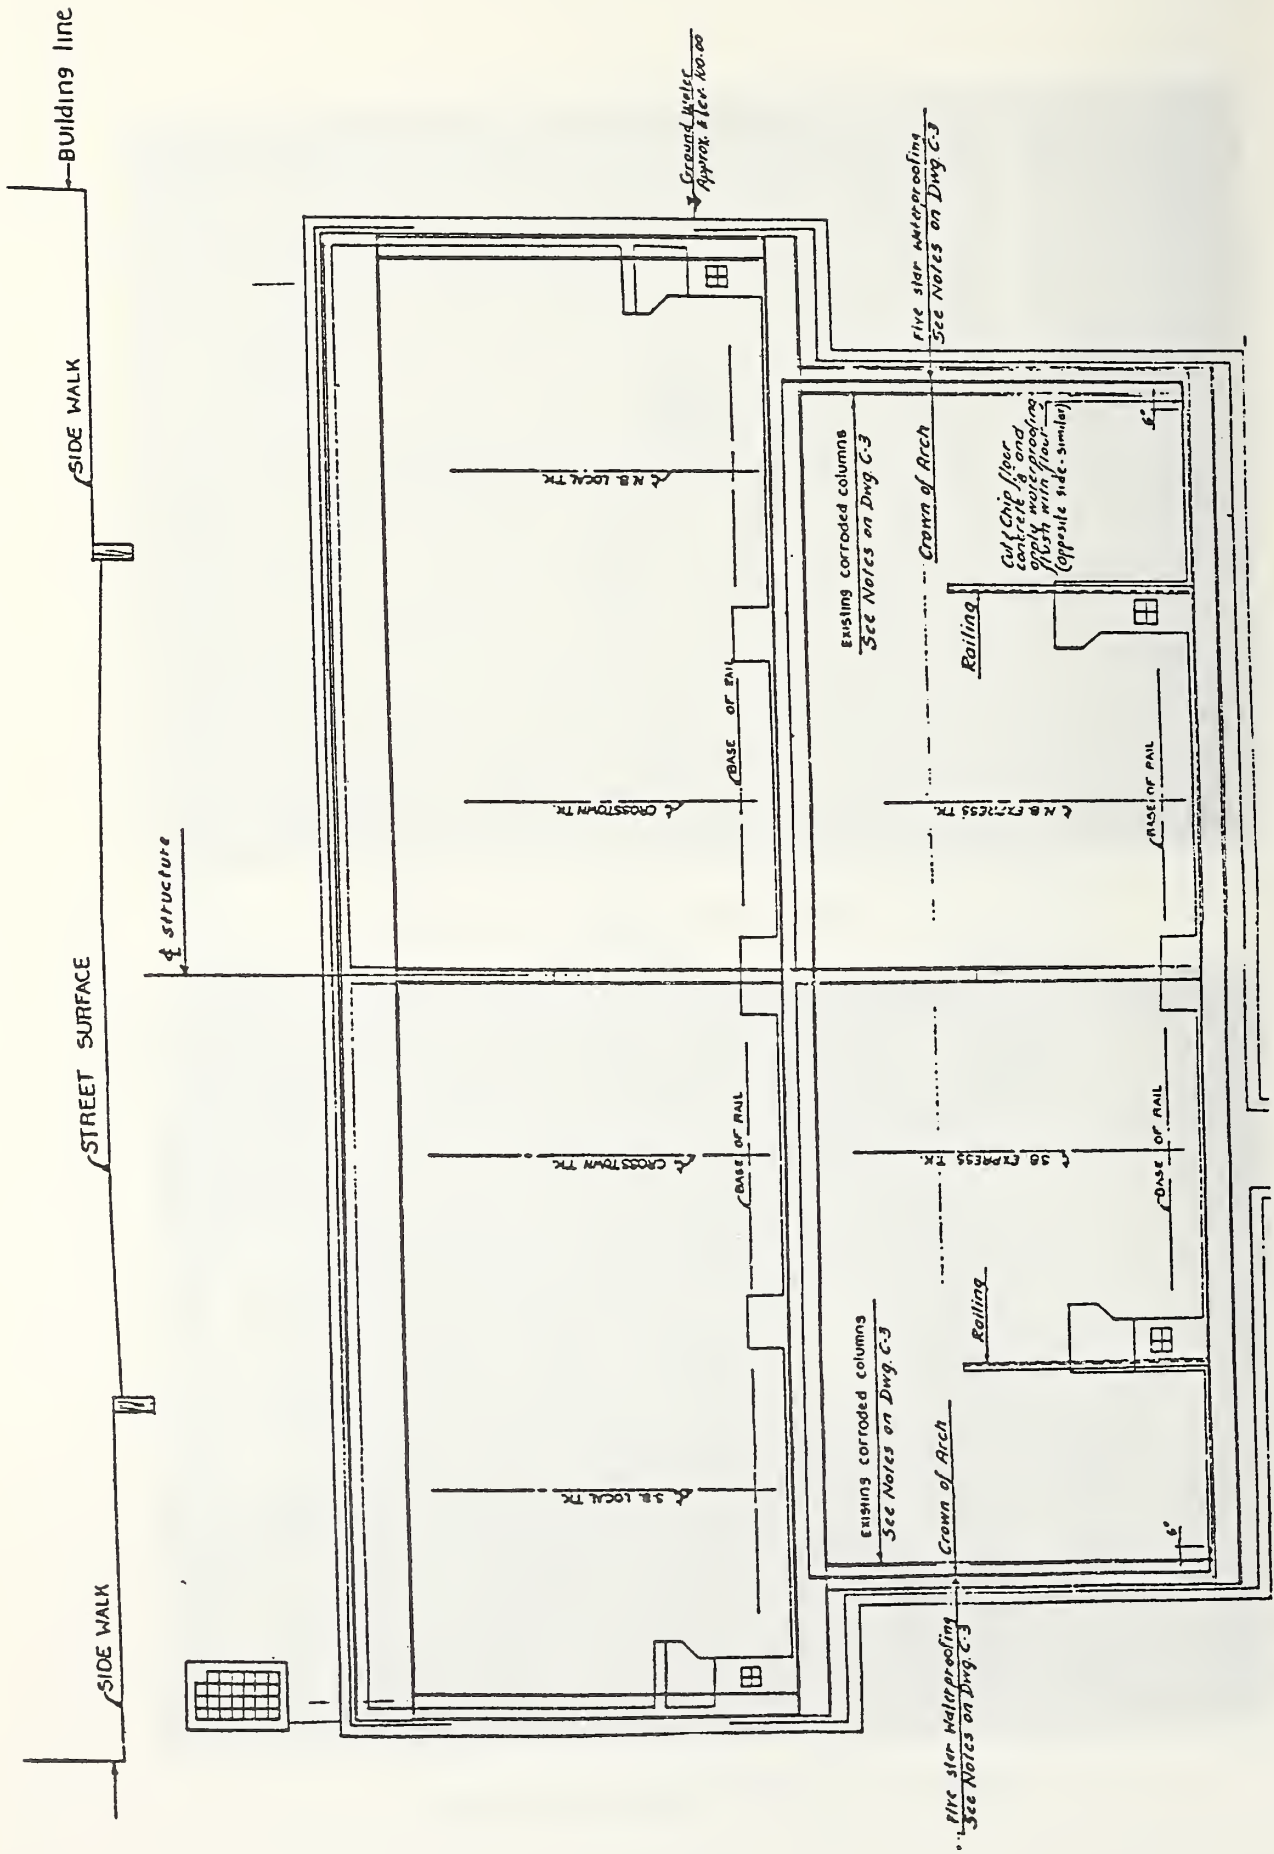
CROSS SECTION OF BERGEN STREET STATION
